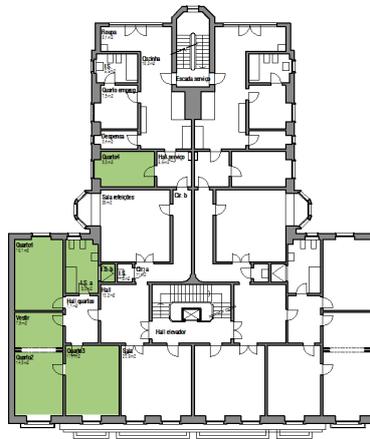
Private area consisting of three bedrooms, a dressing room, a bathroom and a separate dressing room near the service area.
